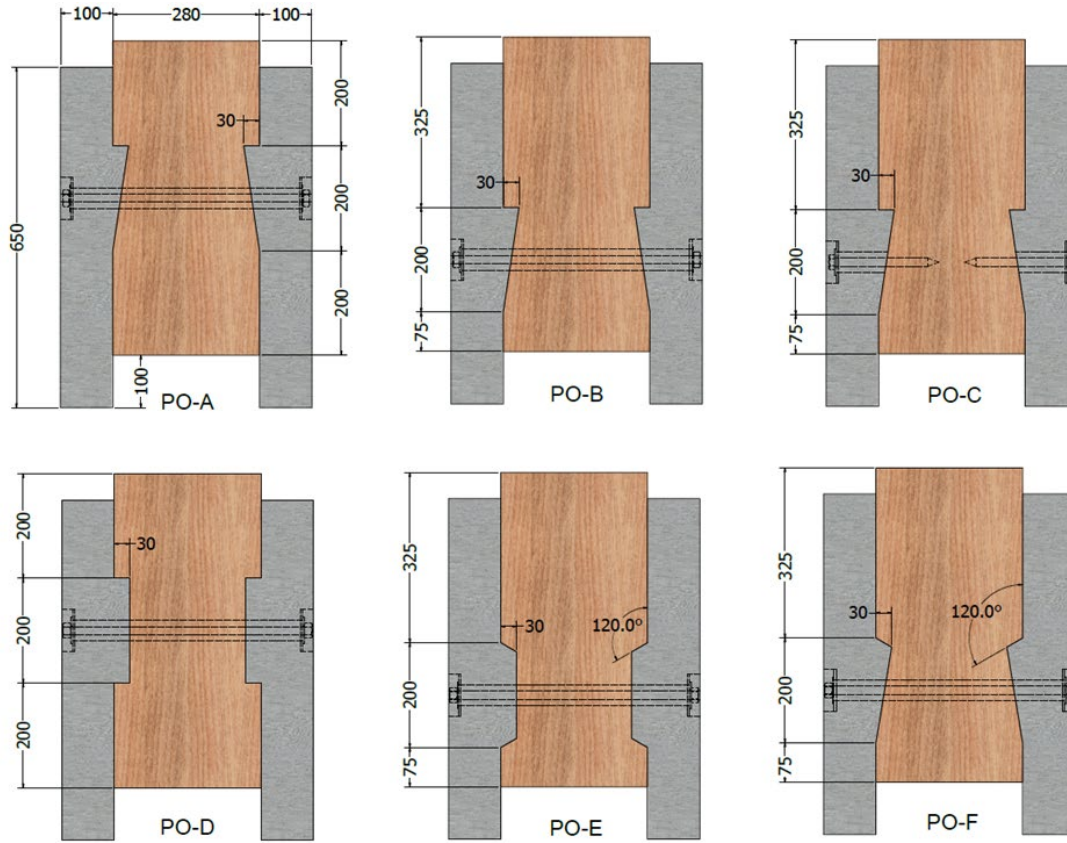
Drawing of all push-out samples. Dimensions are in mm.
